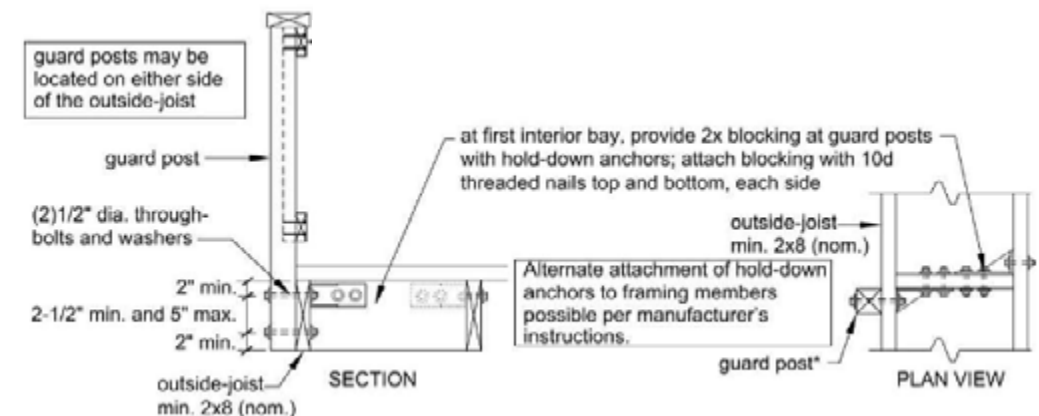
GUARD POST TO OUTSIDE JOIST
